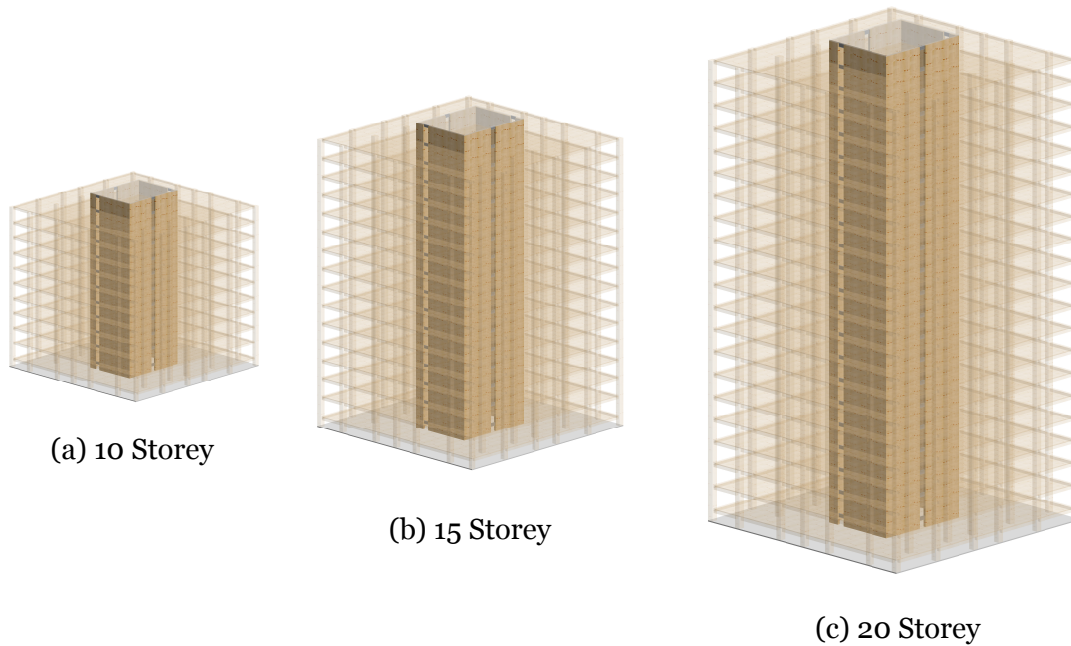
3D View of high-rise-mass-timber building with CW system
